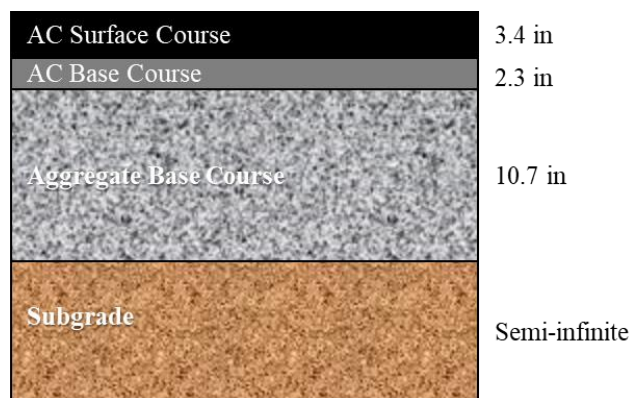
Sketch of Section Pavement Structure based on Core Dimensions
